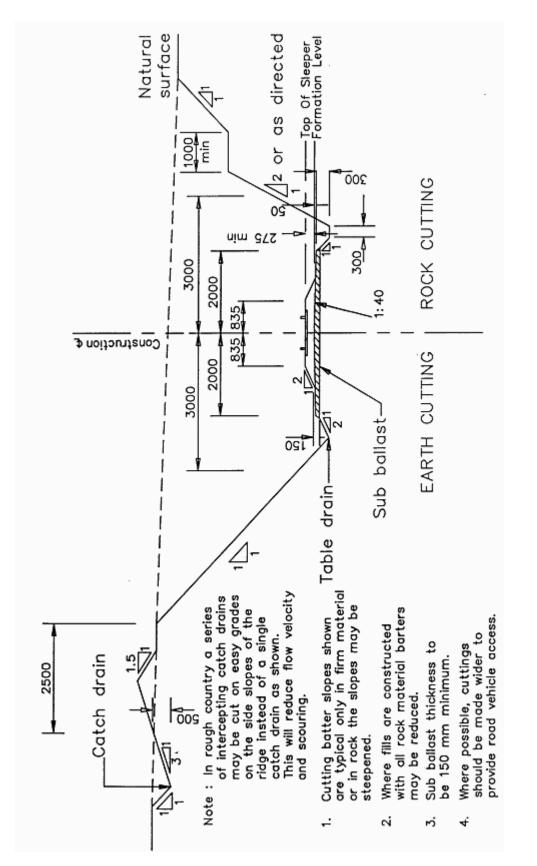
Typical Surface Formation (1 370 mm Concrete Sleepers)
